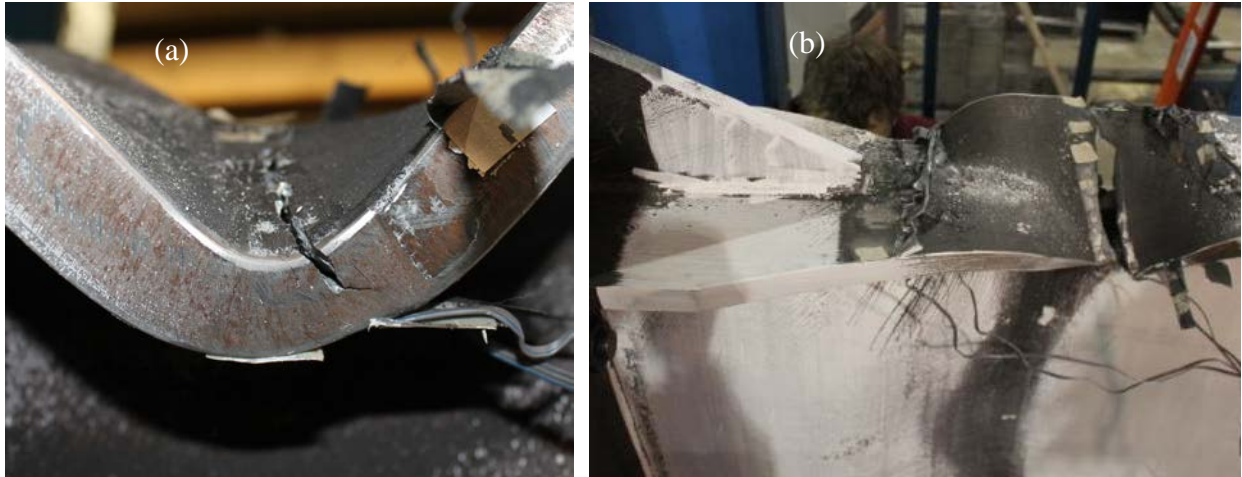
Fracture Propagation Through the Flange Thickness for Specimen 7 (W36x150 with RBS and No Fasteners) Including (a) Partial Depth Crack, and (b) Final Fracture Through Flange
